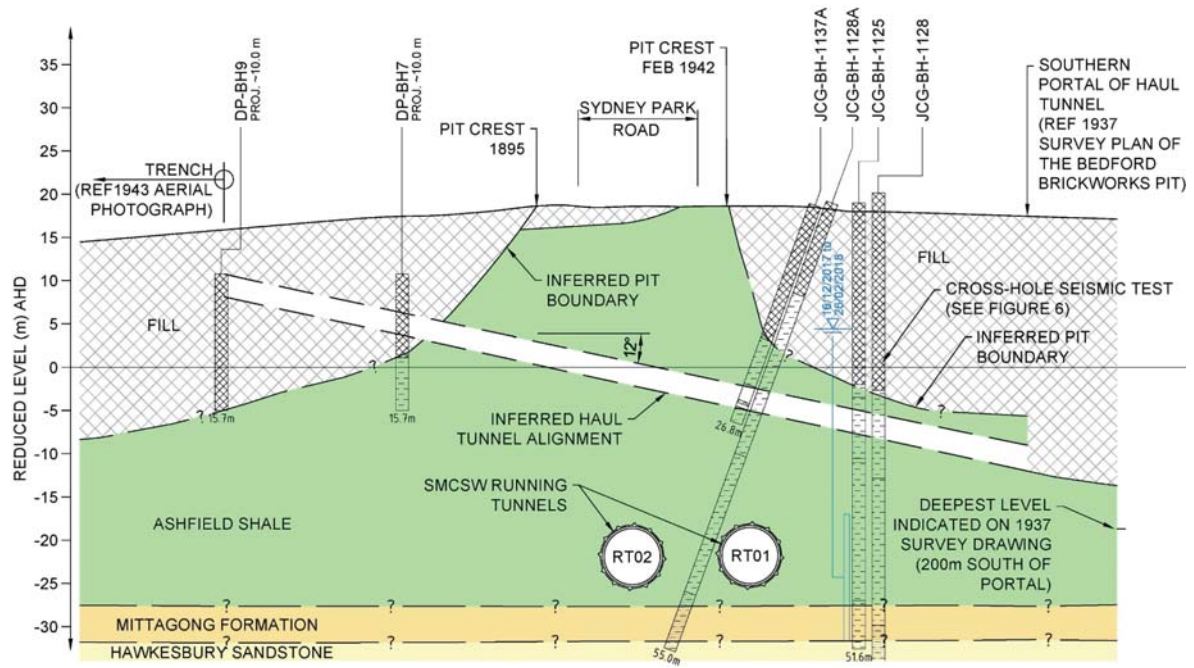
Inferred pit geometry and abandoned haul tunnel alignment at Sydney Park Road.
